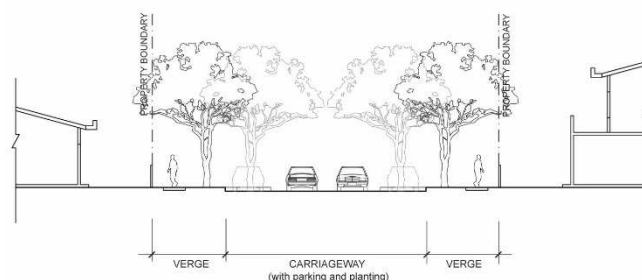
Indicative Layout of a Local Street (with Defined Planting and Parking in Carriageway)
